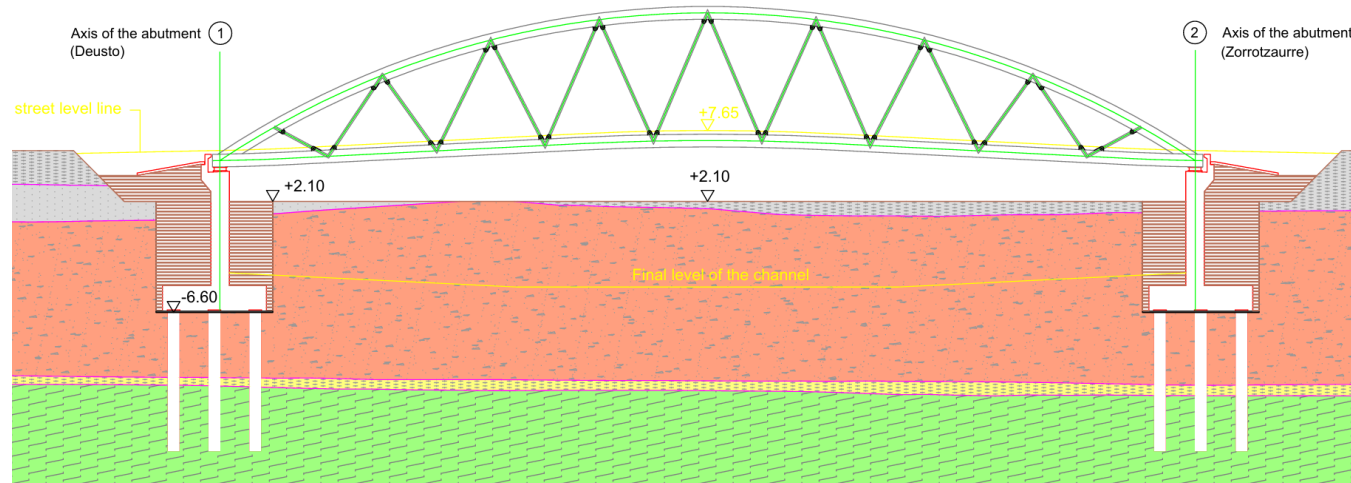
Bridge ready for connection to municipal infrastructure [Own elaboration]
